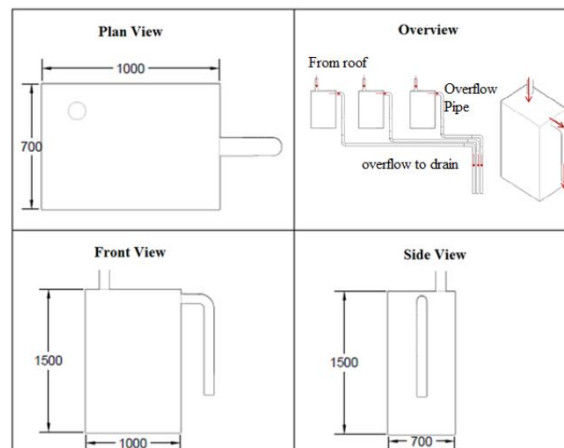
Design Layout of the Wall-Mounted Rainwater Harvesting Tank for Commercial Lot (Wong, 2015)
